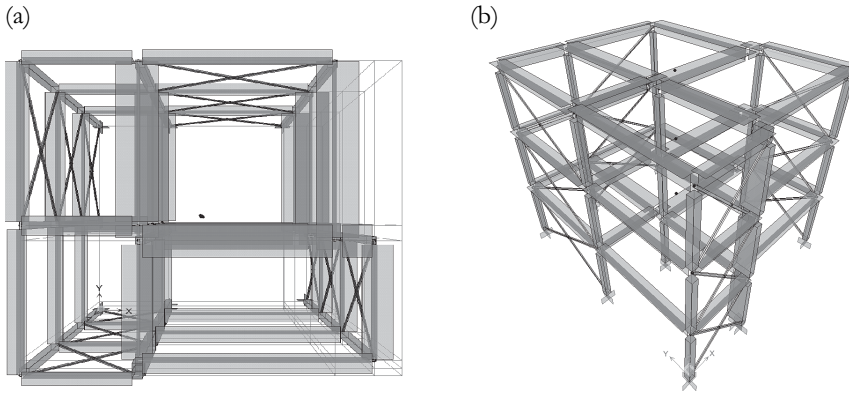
Bracing configuration: plan (a) and 3D (b).
